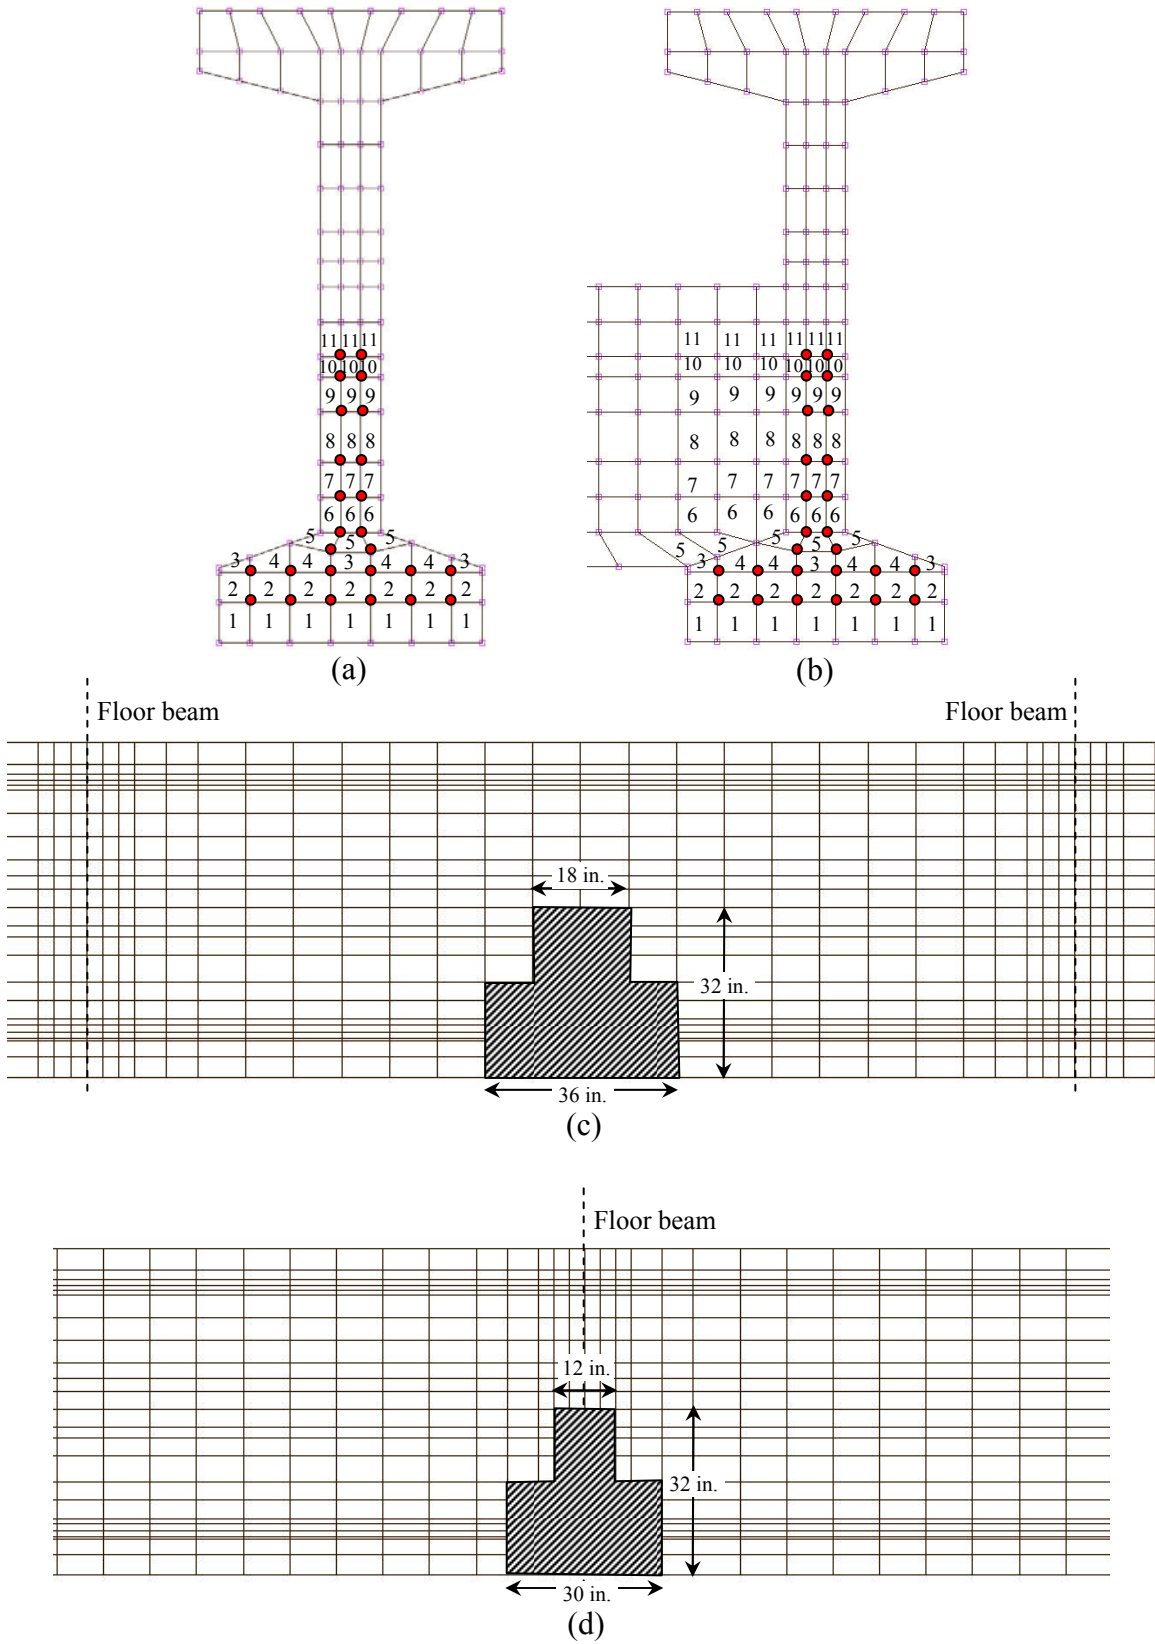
Element removal procedure: (a) between floor beams; (b) at floor beam locations; (c) between floor beams side view, (d) at floor beam locations side view.
